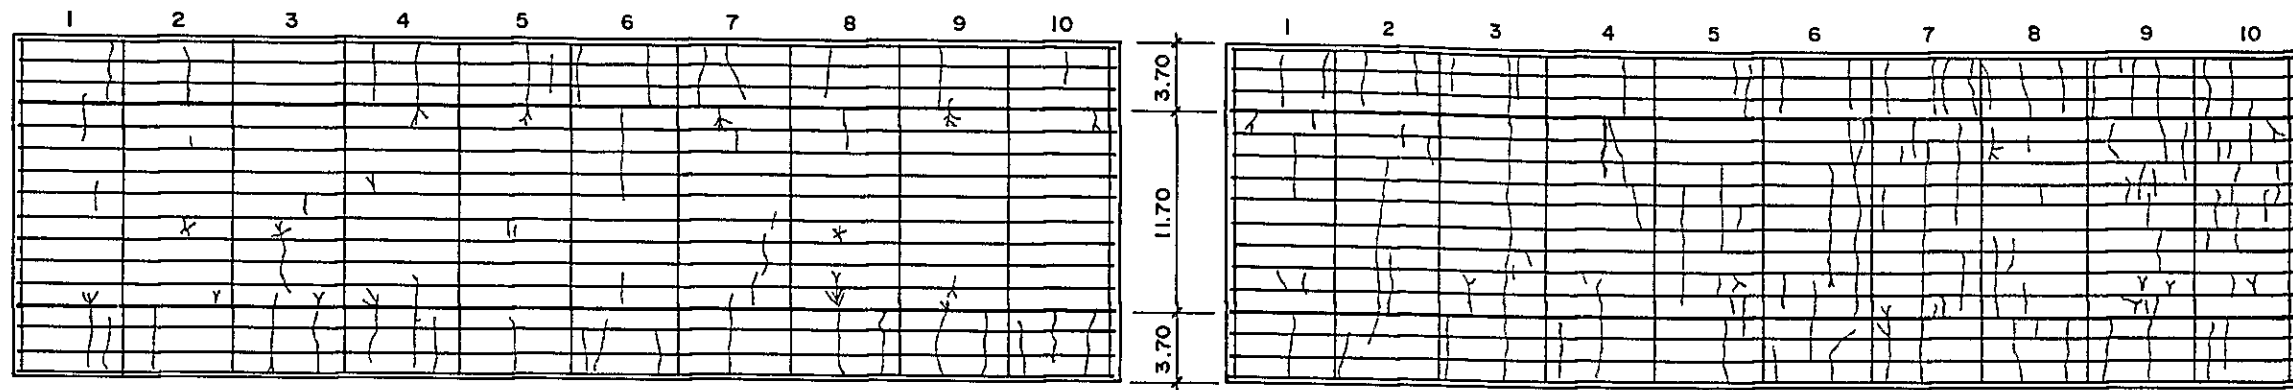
EXISTING FLOOR SLABS ON THE TRUSSED BEAM, BASCULE BRIDGE AND PC COMPOSITE BEAM OF THE APPROACH BRIDGE
